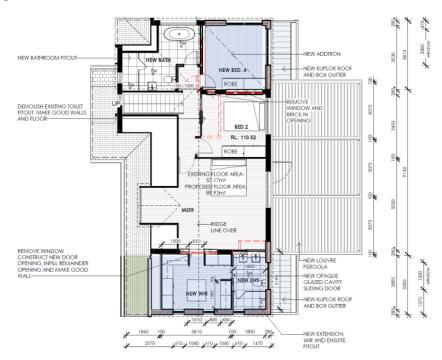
Proposed first floor plan showing walk-in wardrobe /dressing room to the south
